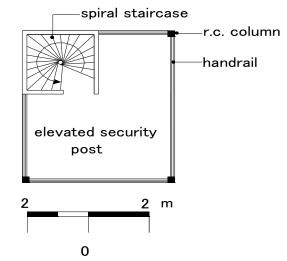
Upper Floor Plan of Elevated Security monitoring Post. Source: author's design
